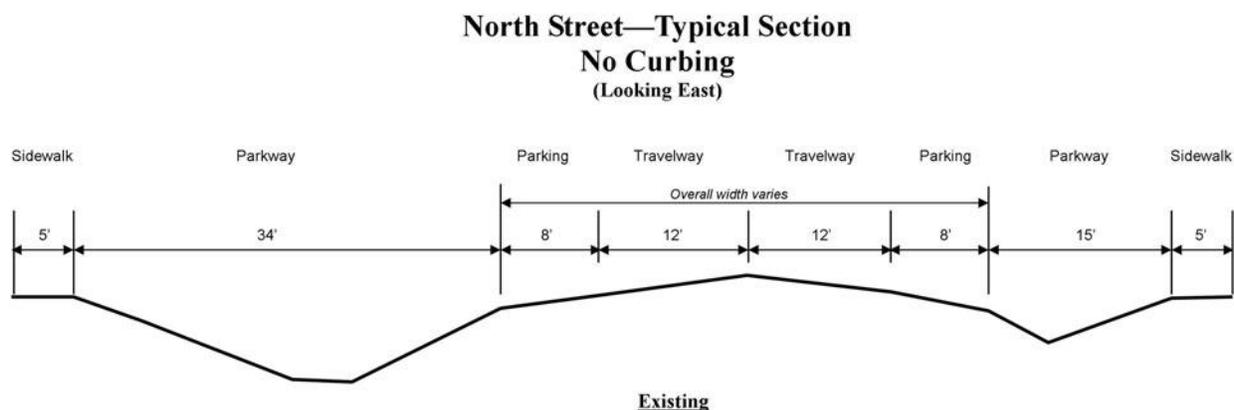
Existing cross section of North Street looking east (Source: Stuart I. Brown Associates, LaBella Associates)
